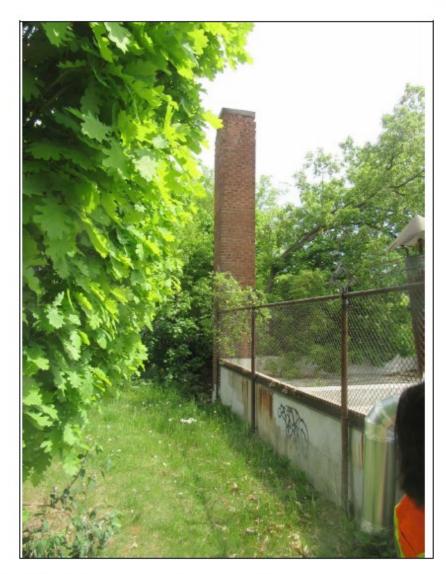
North exterior wall at east end. Adjacent grade is near elevation of roof of building
